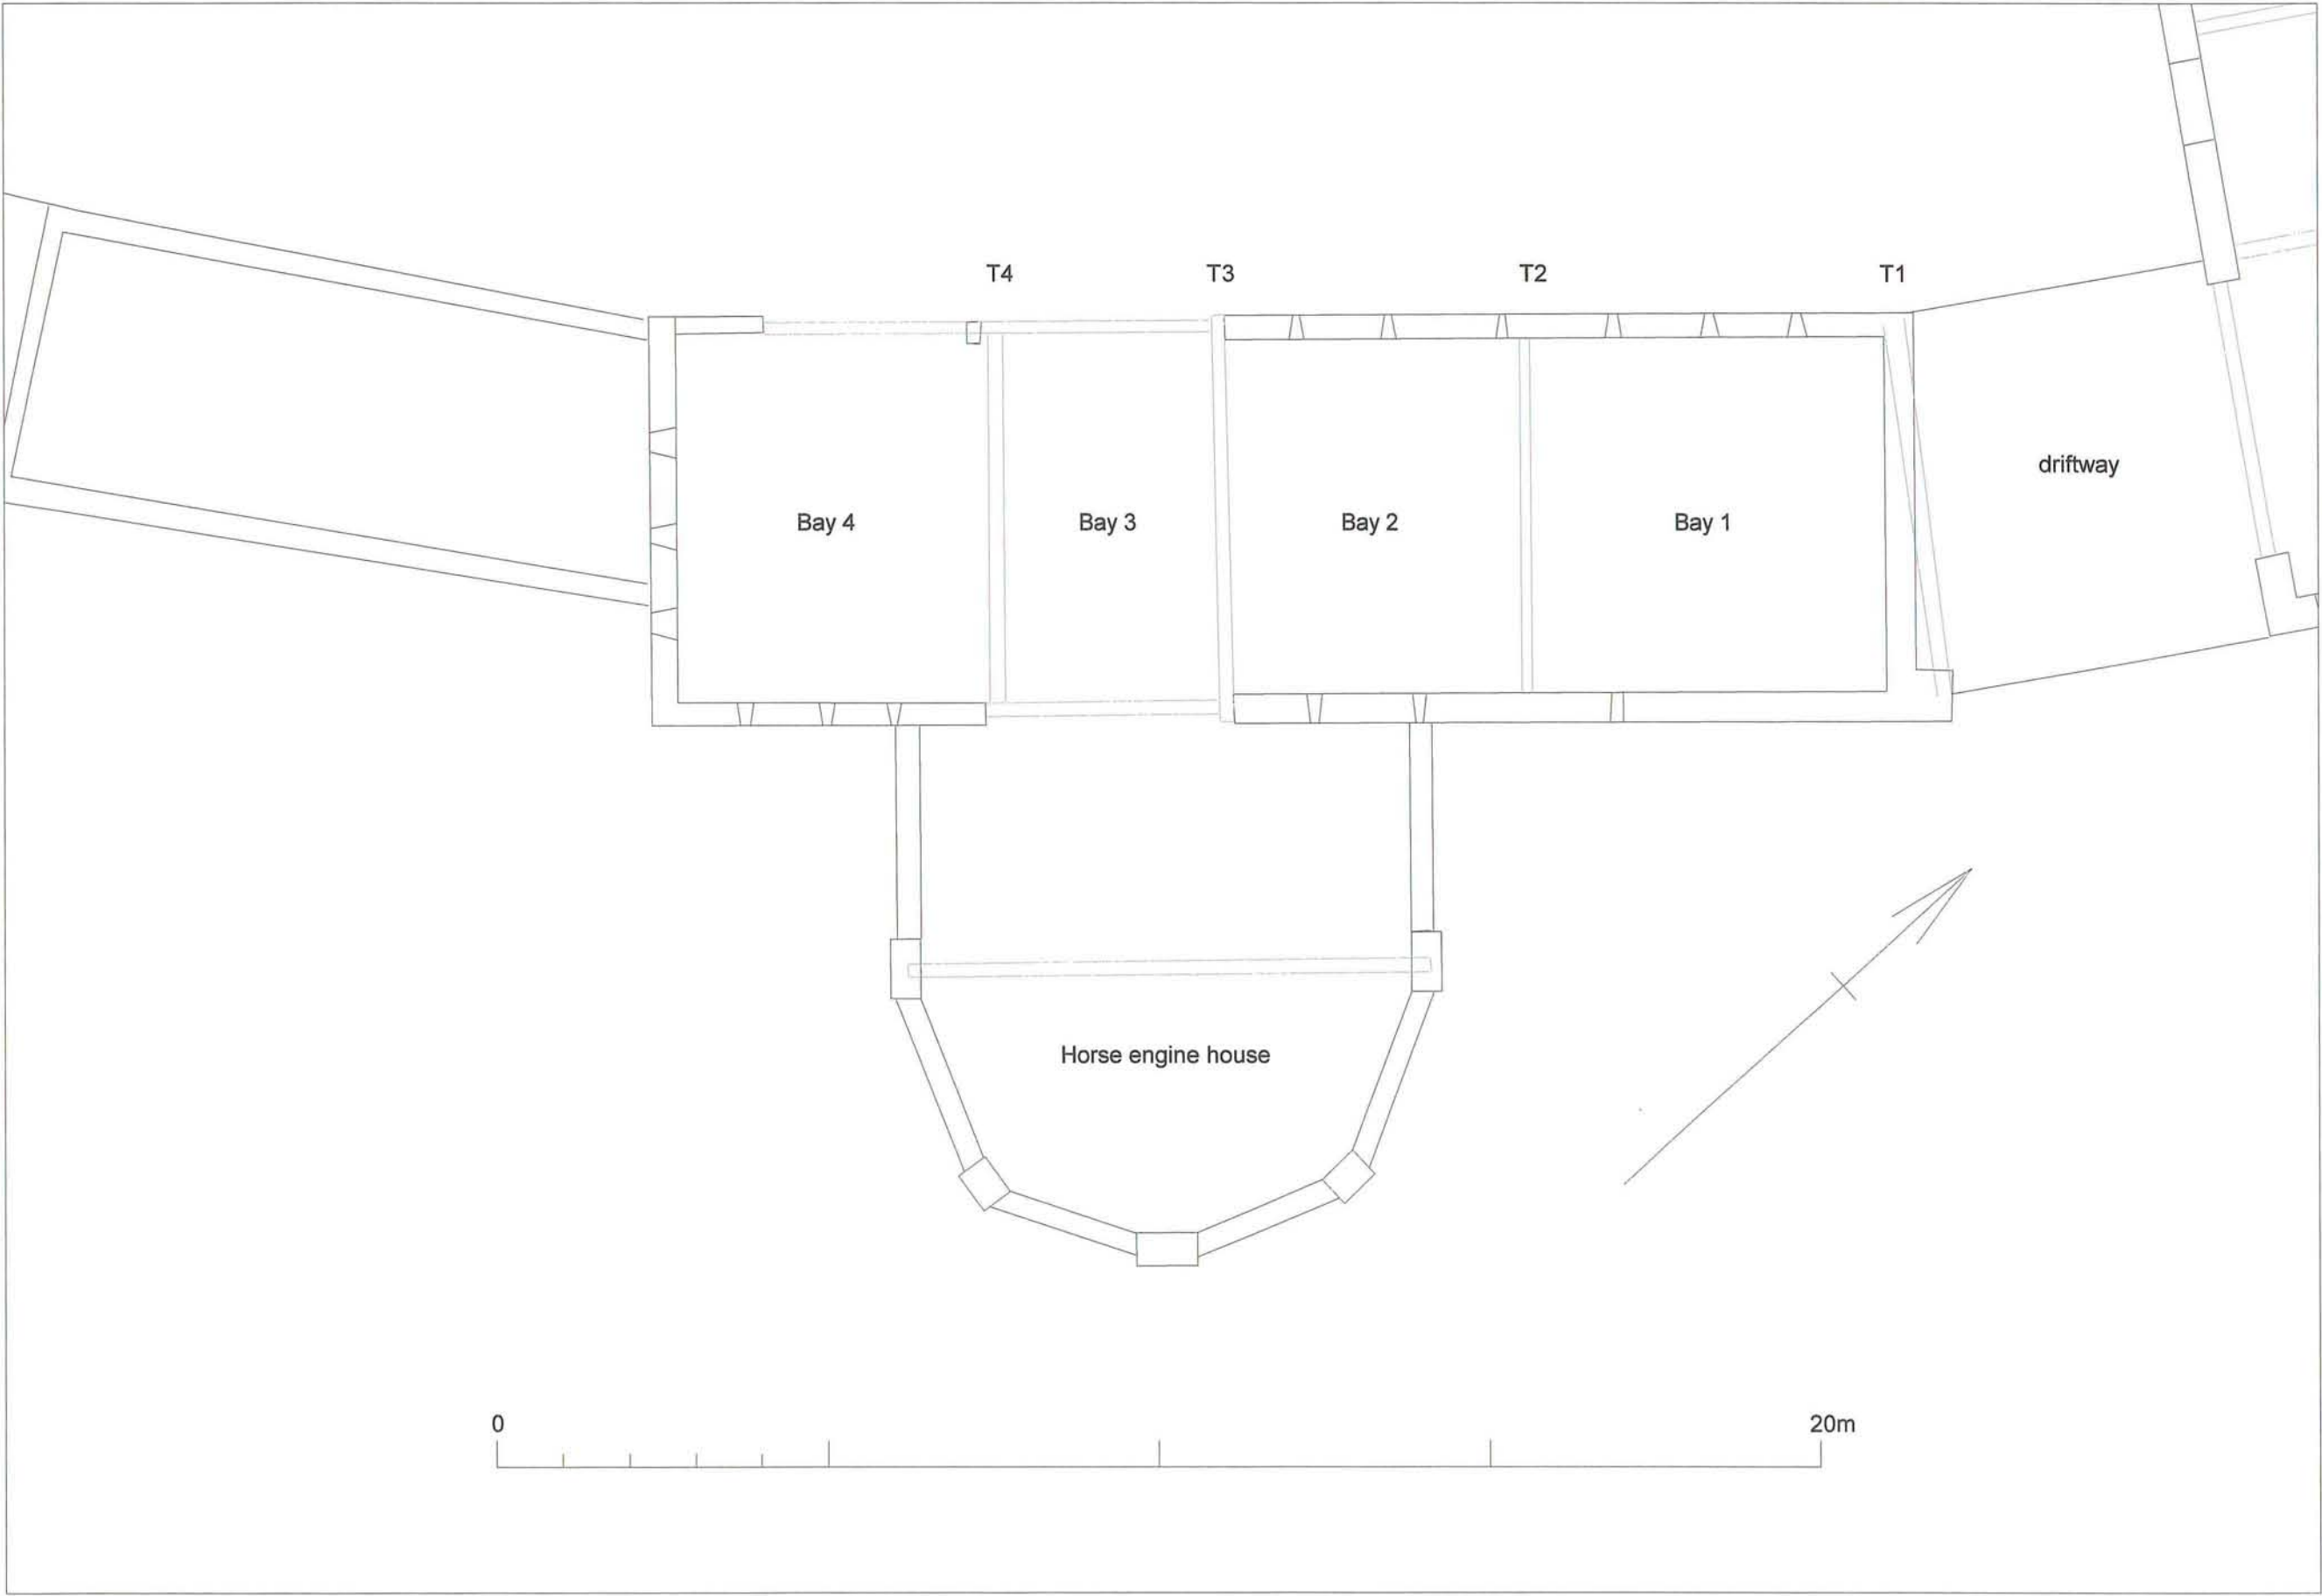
Barn 4 Ground Floor plan, scale 1:100
